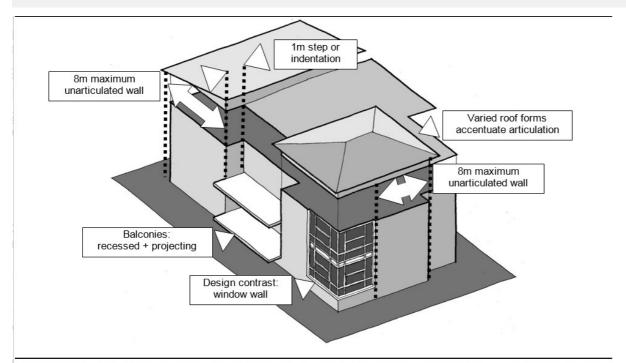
ARTICULATION OF BUILDING FORMS + FACADES
